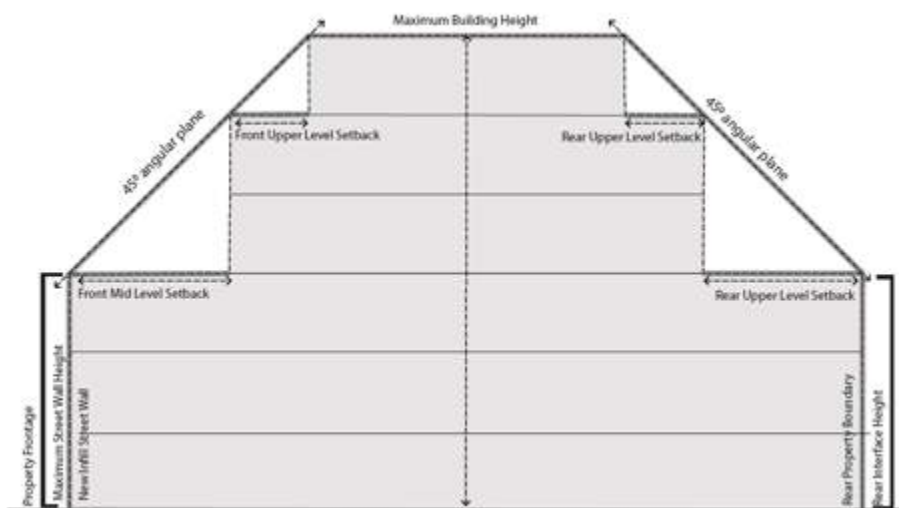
Building envelope requirement – Infill Building (Figure 2 in Yarra DDO15 (version for adoption dated 14 May 2019))
